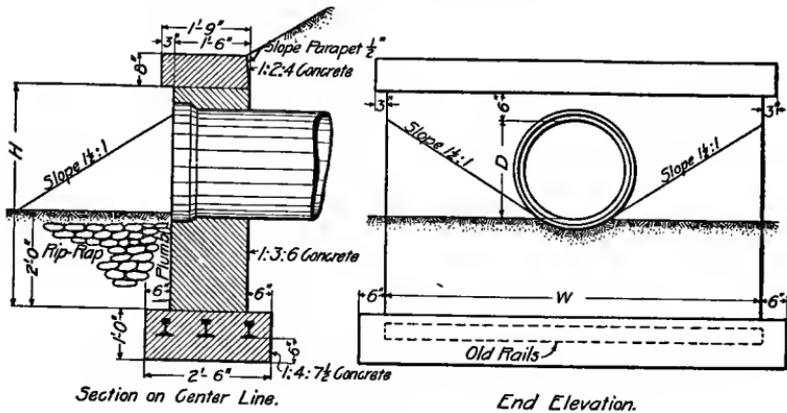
STANDARD PIPE CULVERT. N. Y. C. & H. R. R. R.
